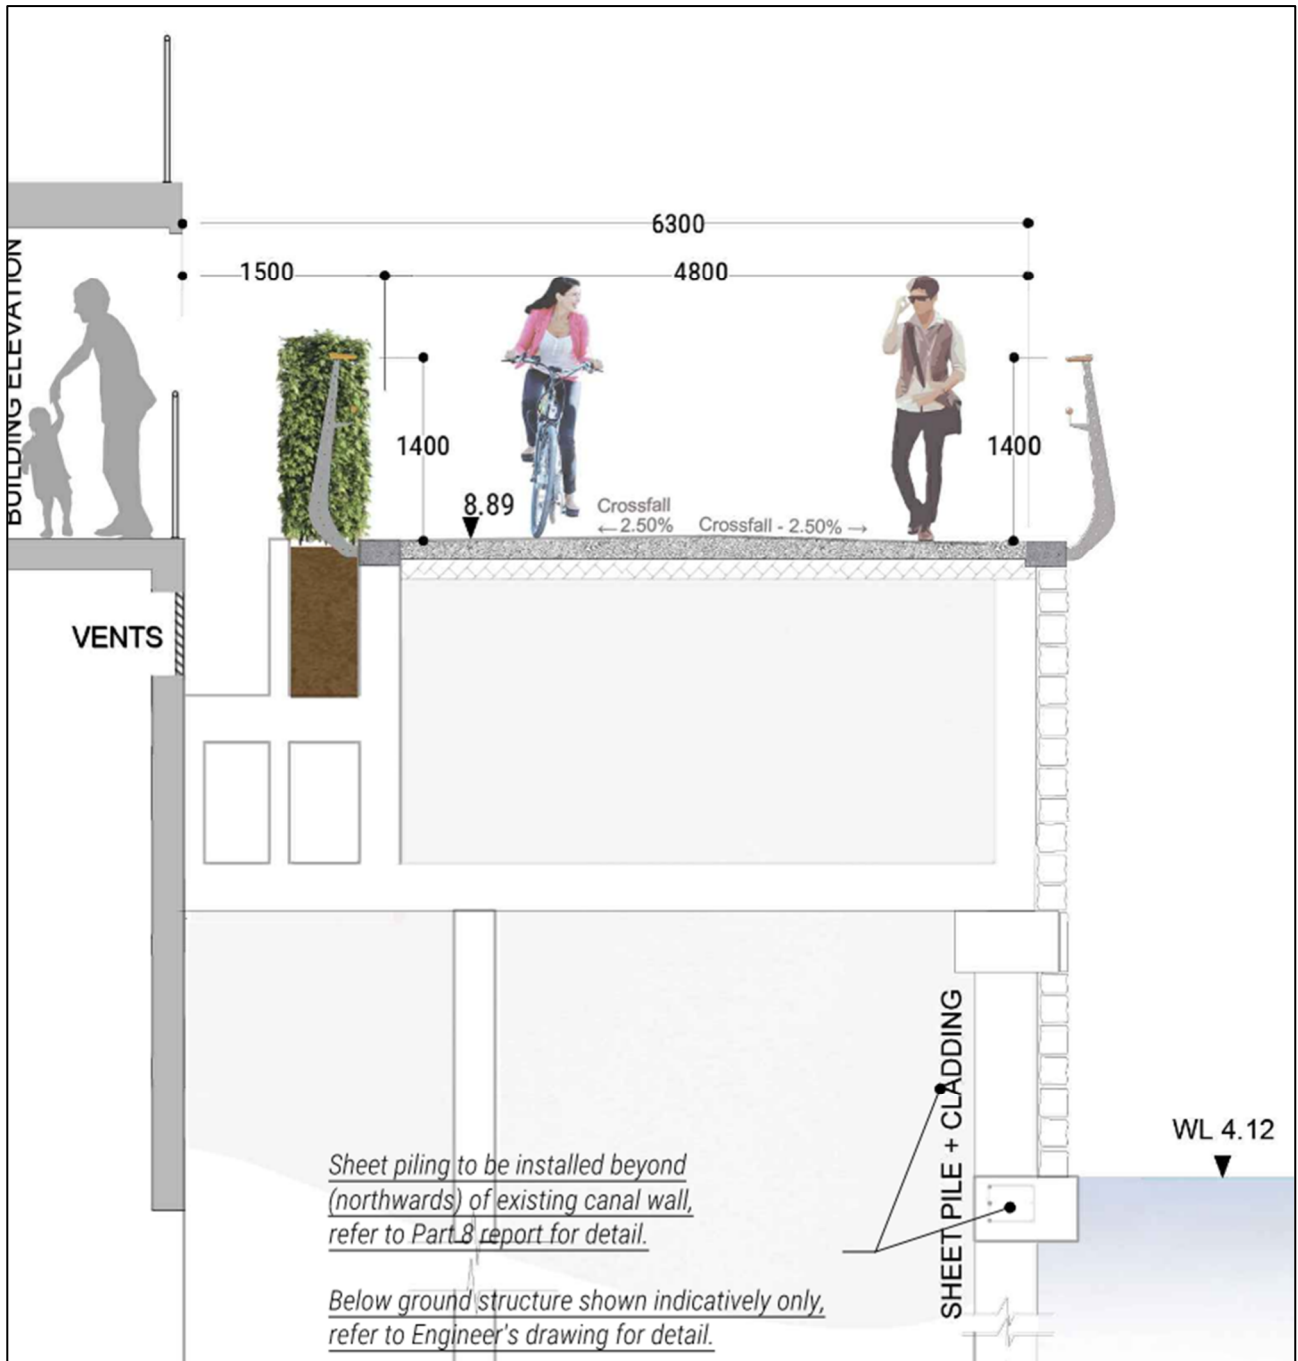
Proposed Cross Section Indicating Offset from Adjacent Structures
